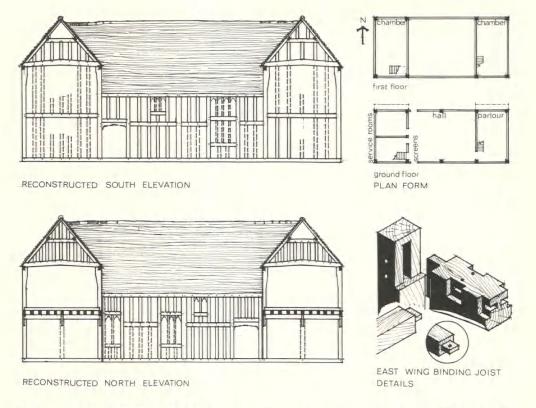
Clawdershill Farm, Shillington: reconstructed elevations, plan form and joint detail. Scale for elevations as figure 6.
